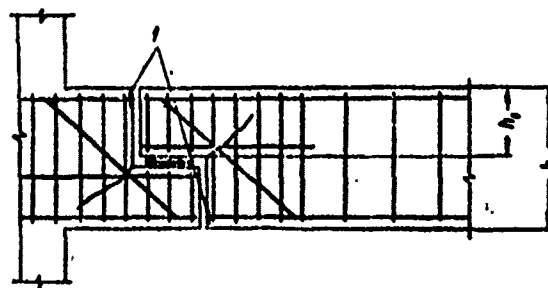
The most probable sites of the formation of inclined cracks in reinforced-concrete beams with a sharply varied transverse sectional height. 1 - anchor washers.
